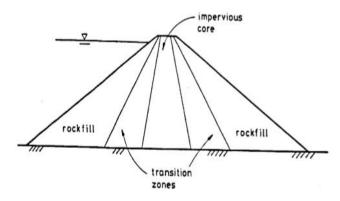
Earthen Dam section with Zoned Earth and Rock fill
